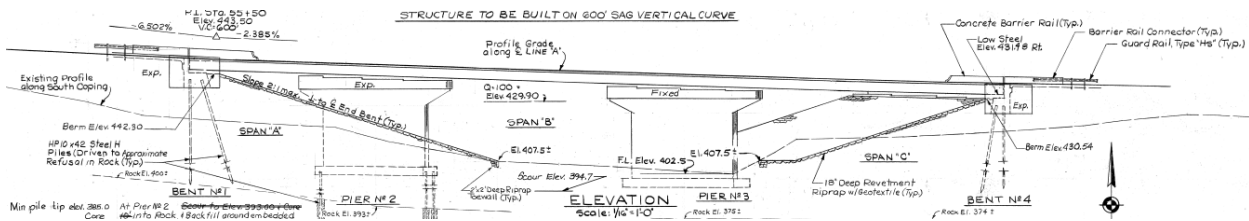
Elevation View of the Bridge (NBI 22240) (1989)
